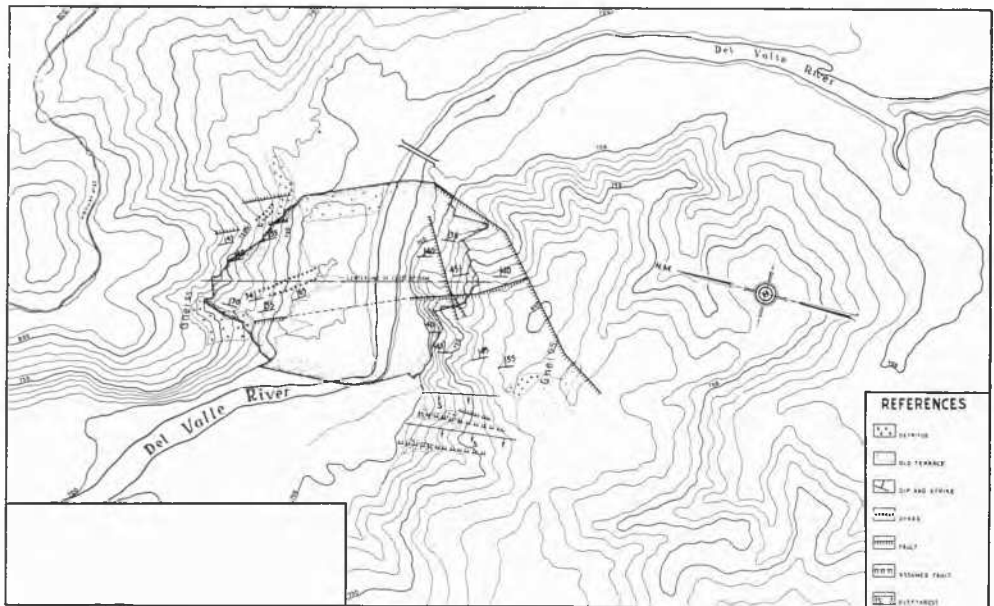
Foundation conditions at Las Piriquitas Dam.
